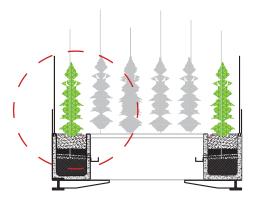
Section: Green platform(Author, 2008) Scale 1: 50
